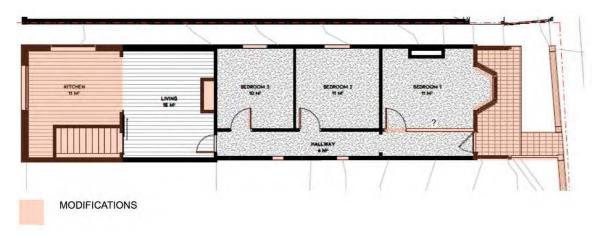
Ground floor plan showing major modifications in orange (undertaken in 1981).
